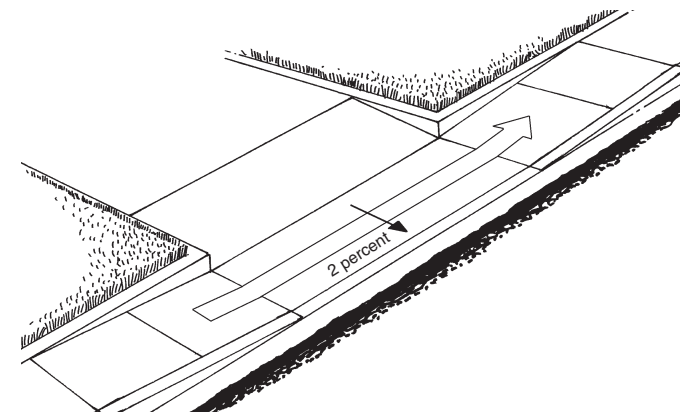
Parallel ramps are an effective way to improve access at curb ramps and driveway crossings if additional right-of-way cannot be purchased. There needs to be adequate drainage for this type of installation.
